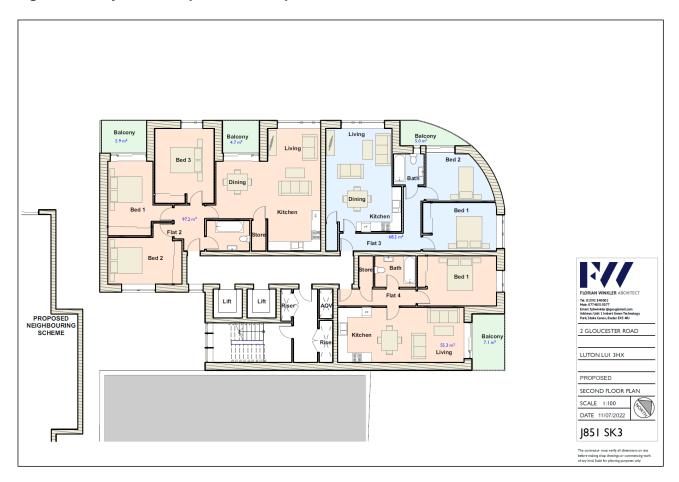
Layout of Proposed Development at 2nd Floor Level
